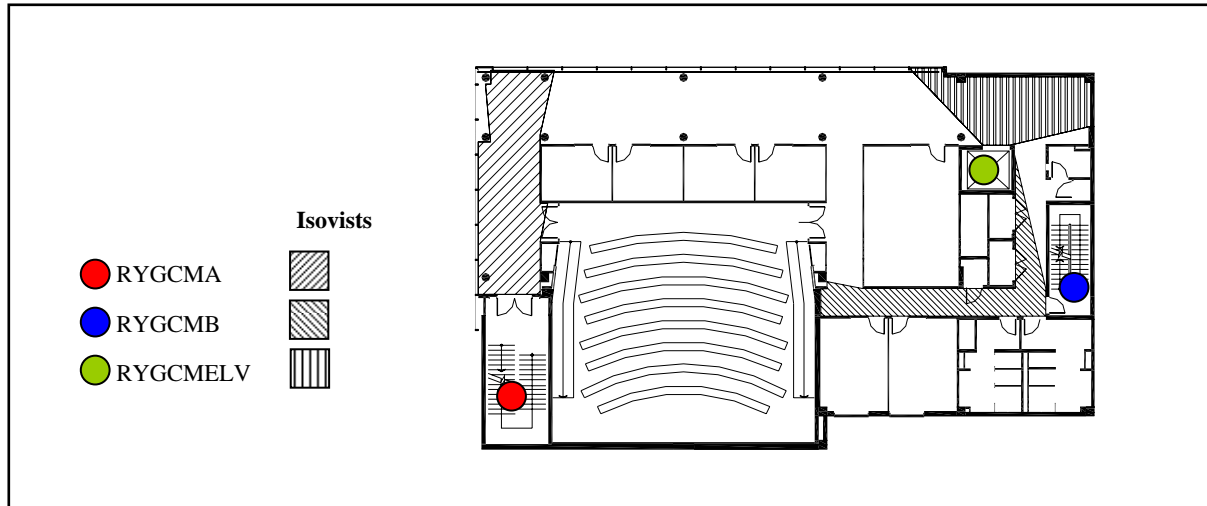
Plan of Building RYGCM indicating the Areas of Stair Isovist
